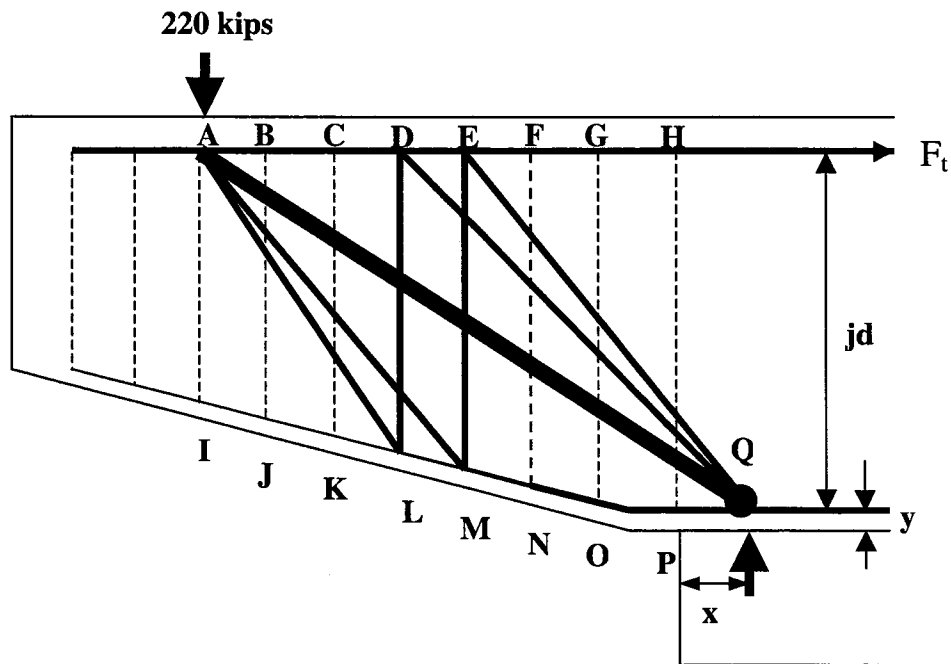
Truss Model: Cantilevered End of a Typical Bent Cap Specimen:
